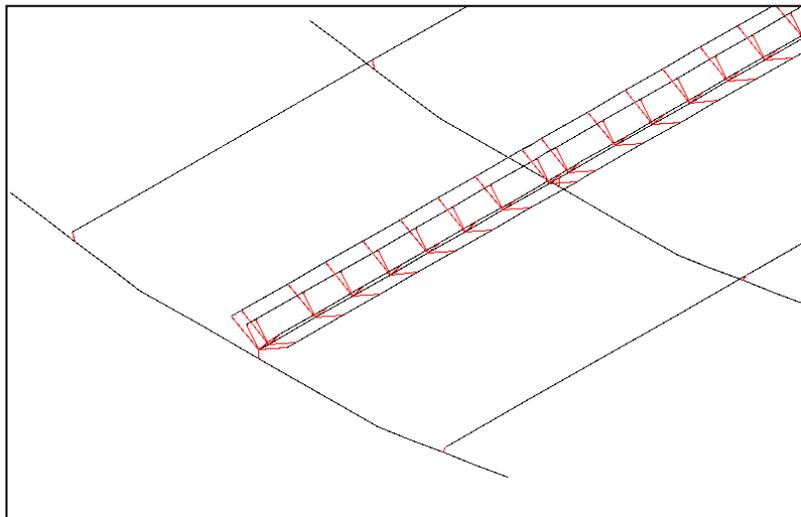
T beams are rigidly connected to the railway girder beam at each diaphragm location.
